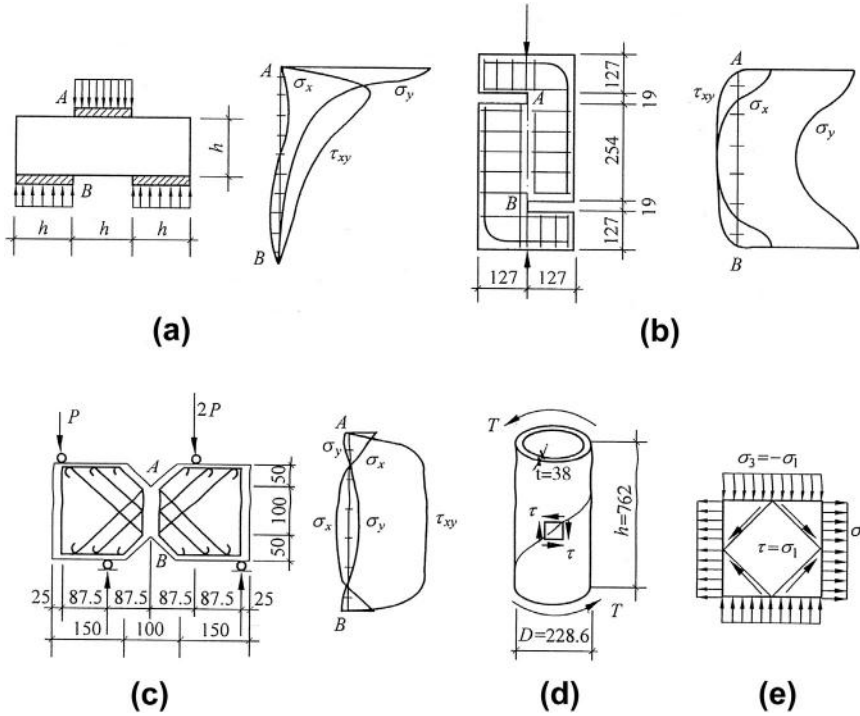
Testing methods for shear resistance of concrete and distributions of shear stress on critical sections [2-31]: (a) short rectangular beam, (b) specimen in Z shape, (c) beam with notches, (d) circular tube, (e) biaxial compression-tension
